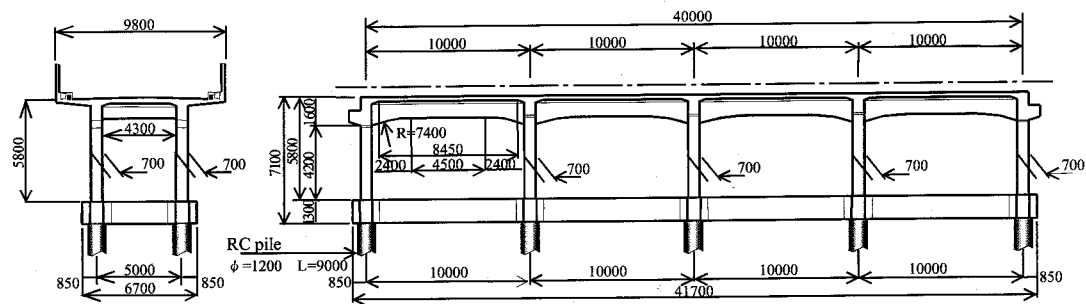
Railway Rigid Frame Viaduct Bridge
